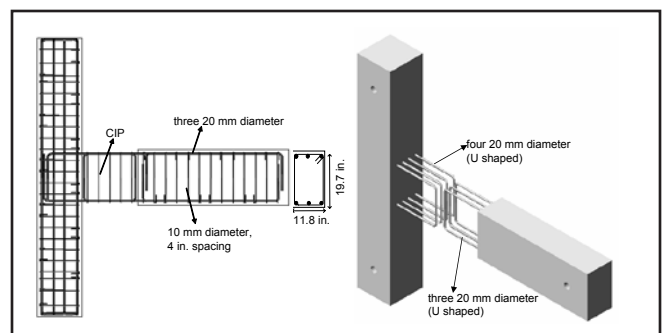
Detail of cast-in-place in beam connection. Note: 1 in. = 25.4 mm.
